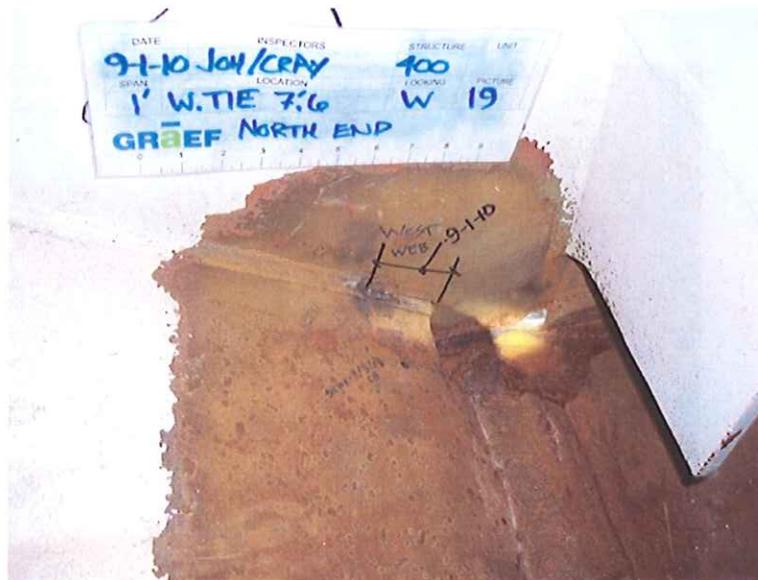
Arch/tie girder intersection - visually evident longitudinal crack along arch to tie girder web weld
